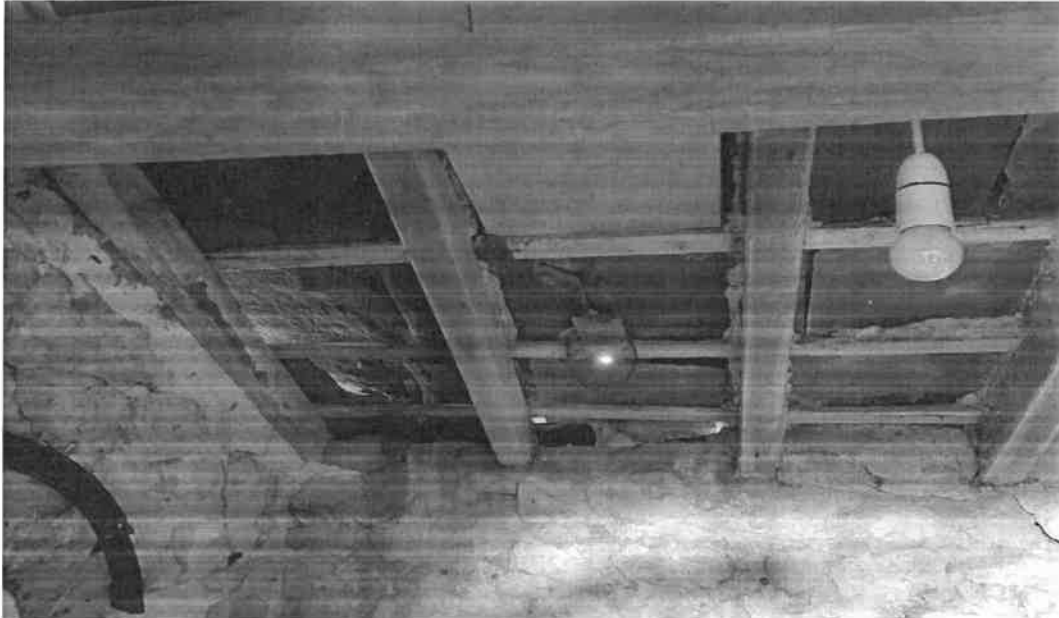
Example of gaps around lintels, stonework and joists from room A.
